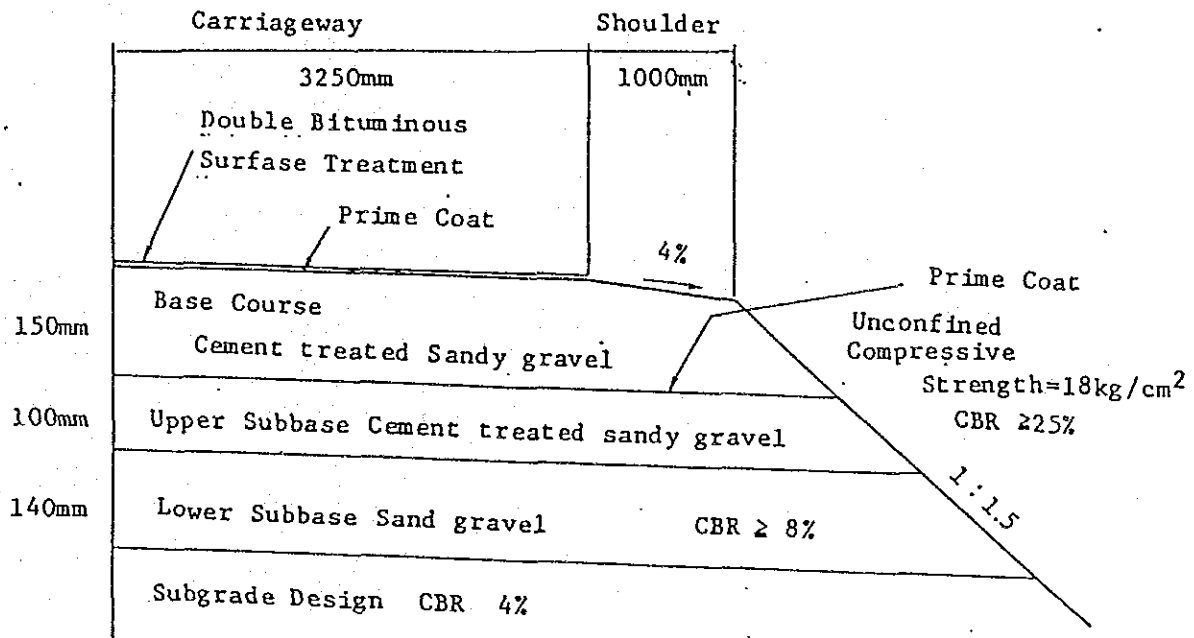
PAVEMENT DESIGN PROPOSED FOR LOT II
